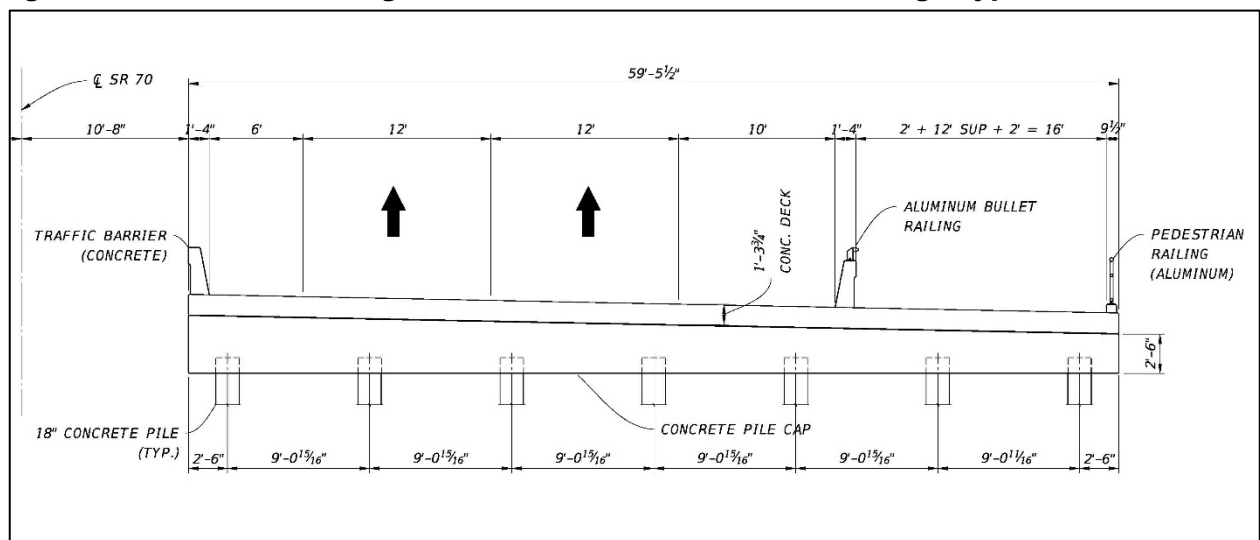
S.R. 70 over Slough Ditch (C-41A) Canal Eastbound Bridge Typical Section
